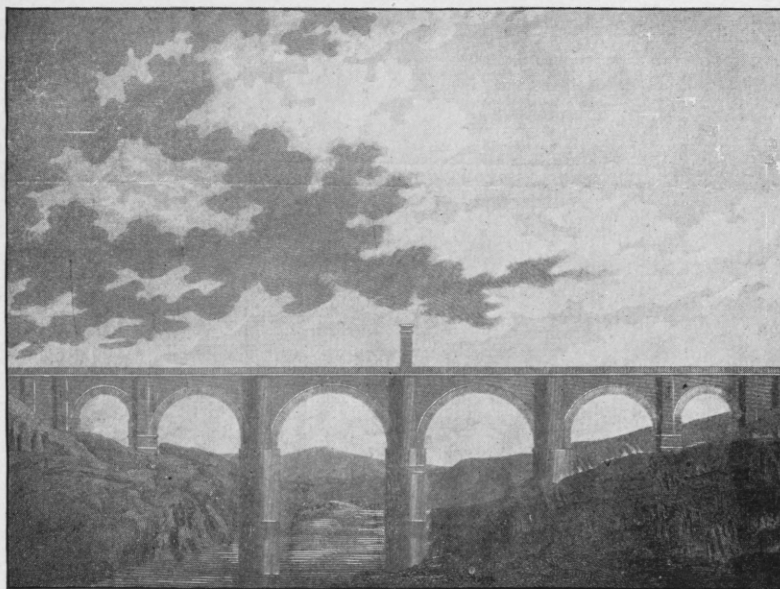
Old Bridge at Alcantara, Spain. (104 A.D.)
